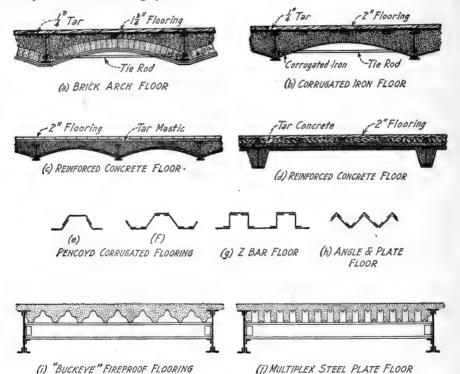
EXAMPLES OF SHOP FLOORS ABOVE GROUND.
